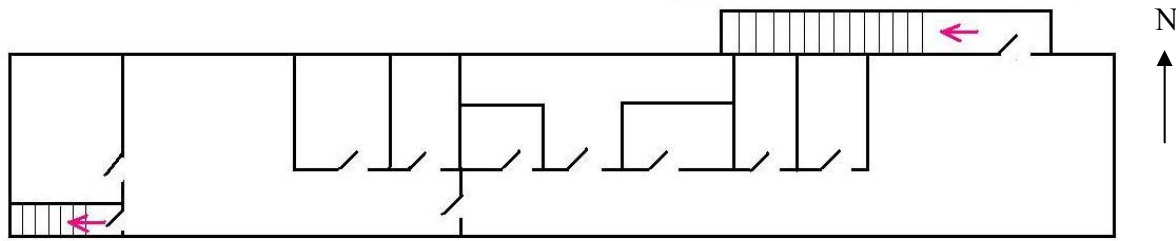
Plan view of Mezzanine and Offices in retail warehouse (not to scale)
